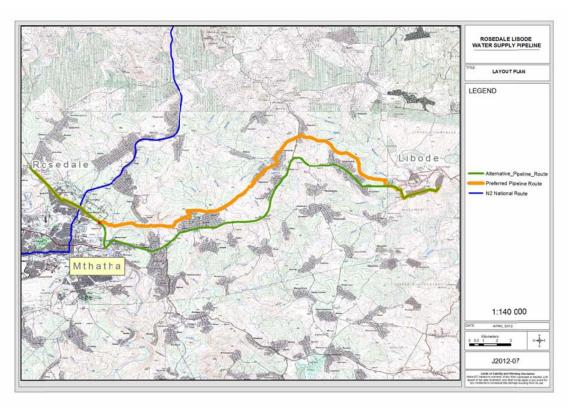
Layout Plan illustrating the alternative routes 9Alternative A1 in orange and Alternative A2 in green) considered for the application.
